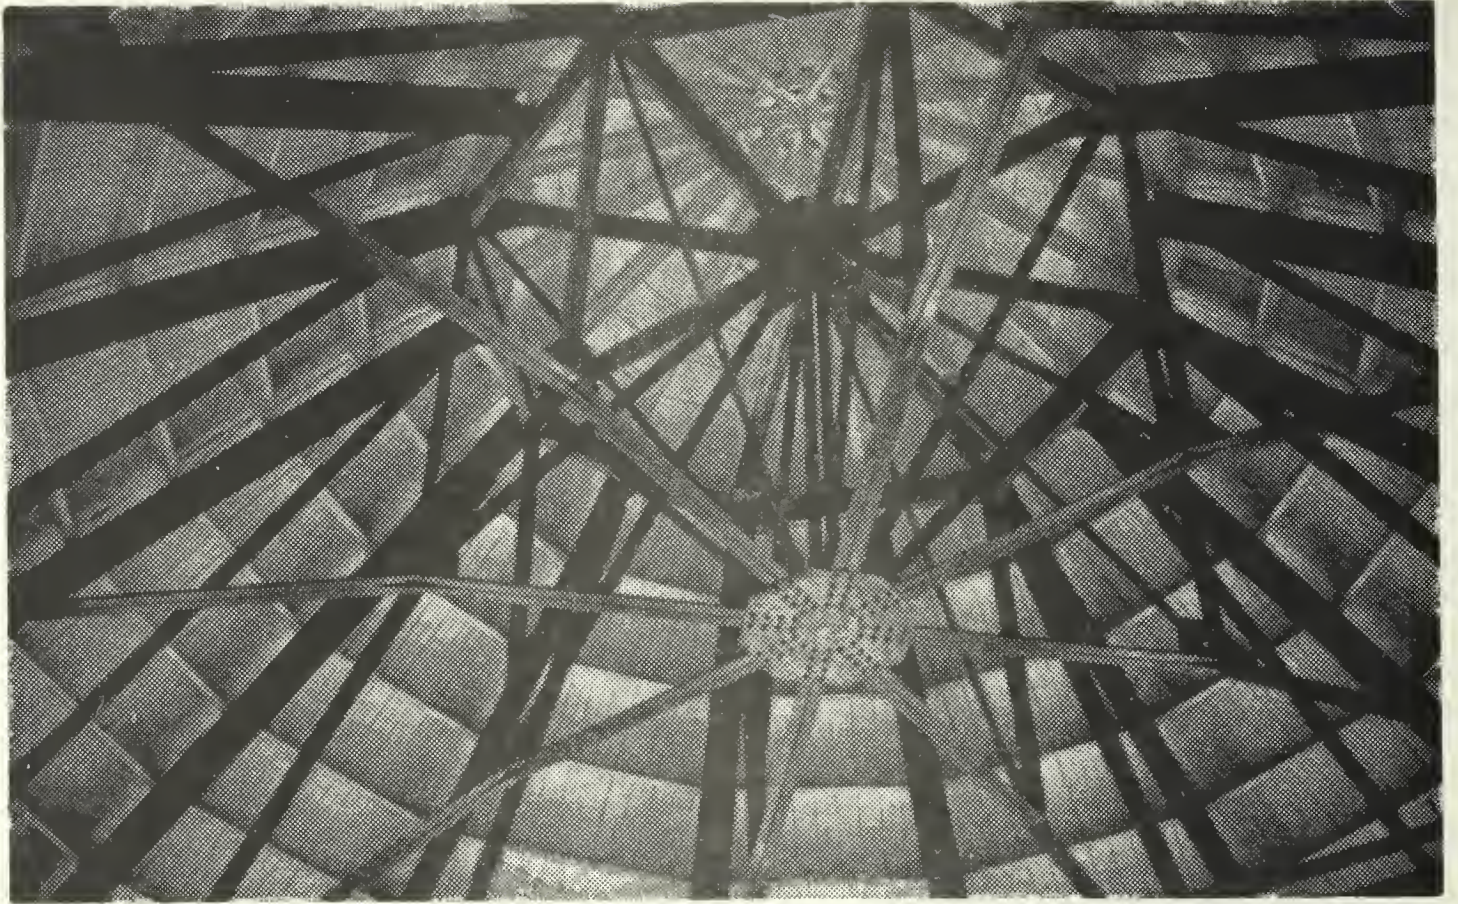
A. East St. Louis Waterworks, Interior Ceiling Truss, 1980.
